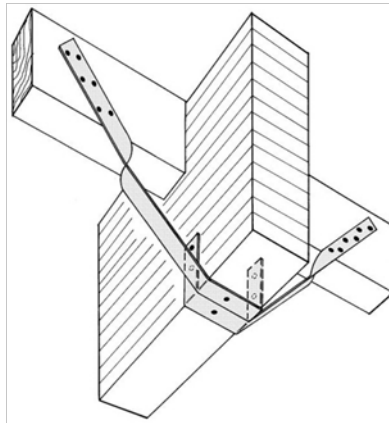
TYPICAL TVB KNEE BRACE INSTALLATION
